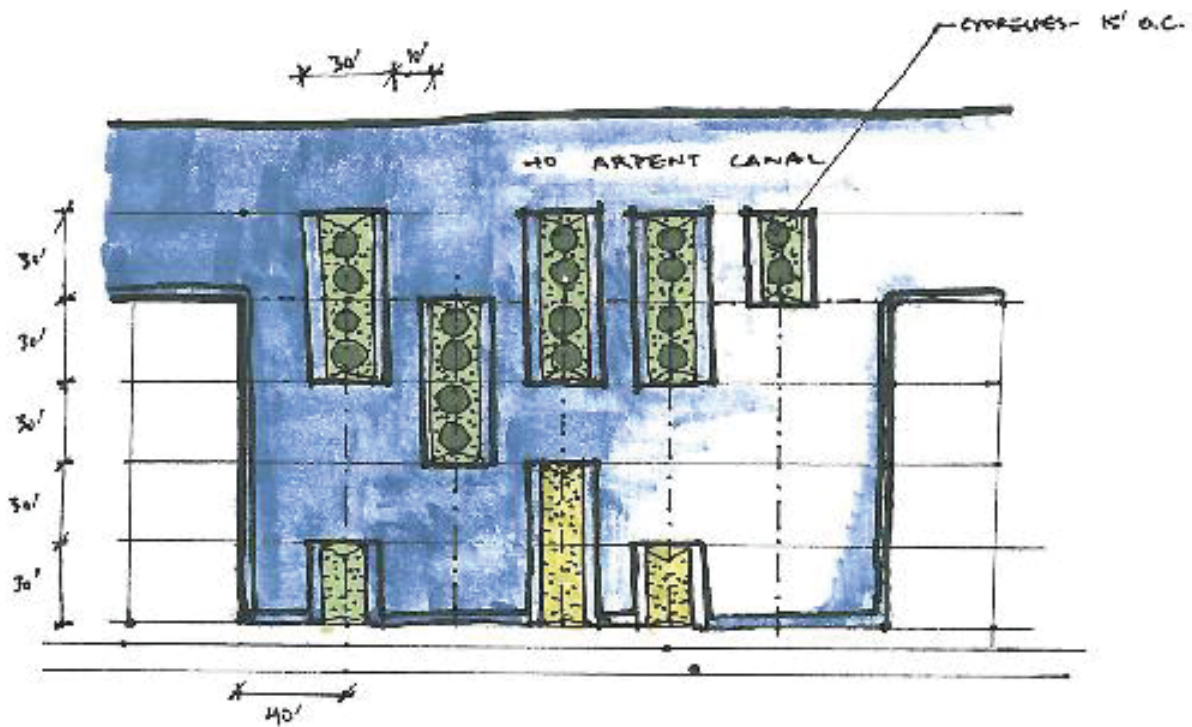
Typical plan for proposed lagoons on 40 Arpent Canal.
